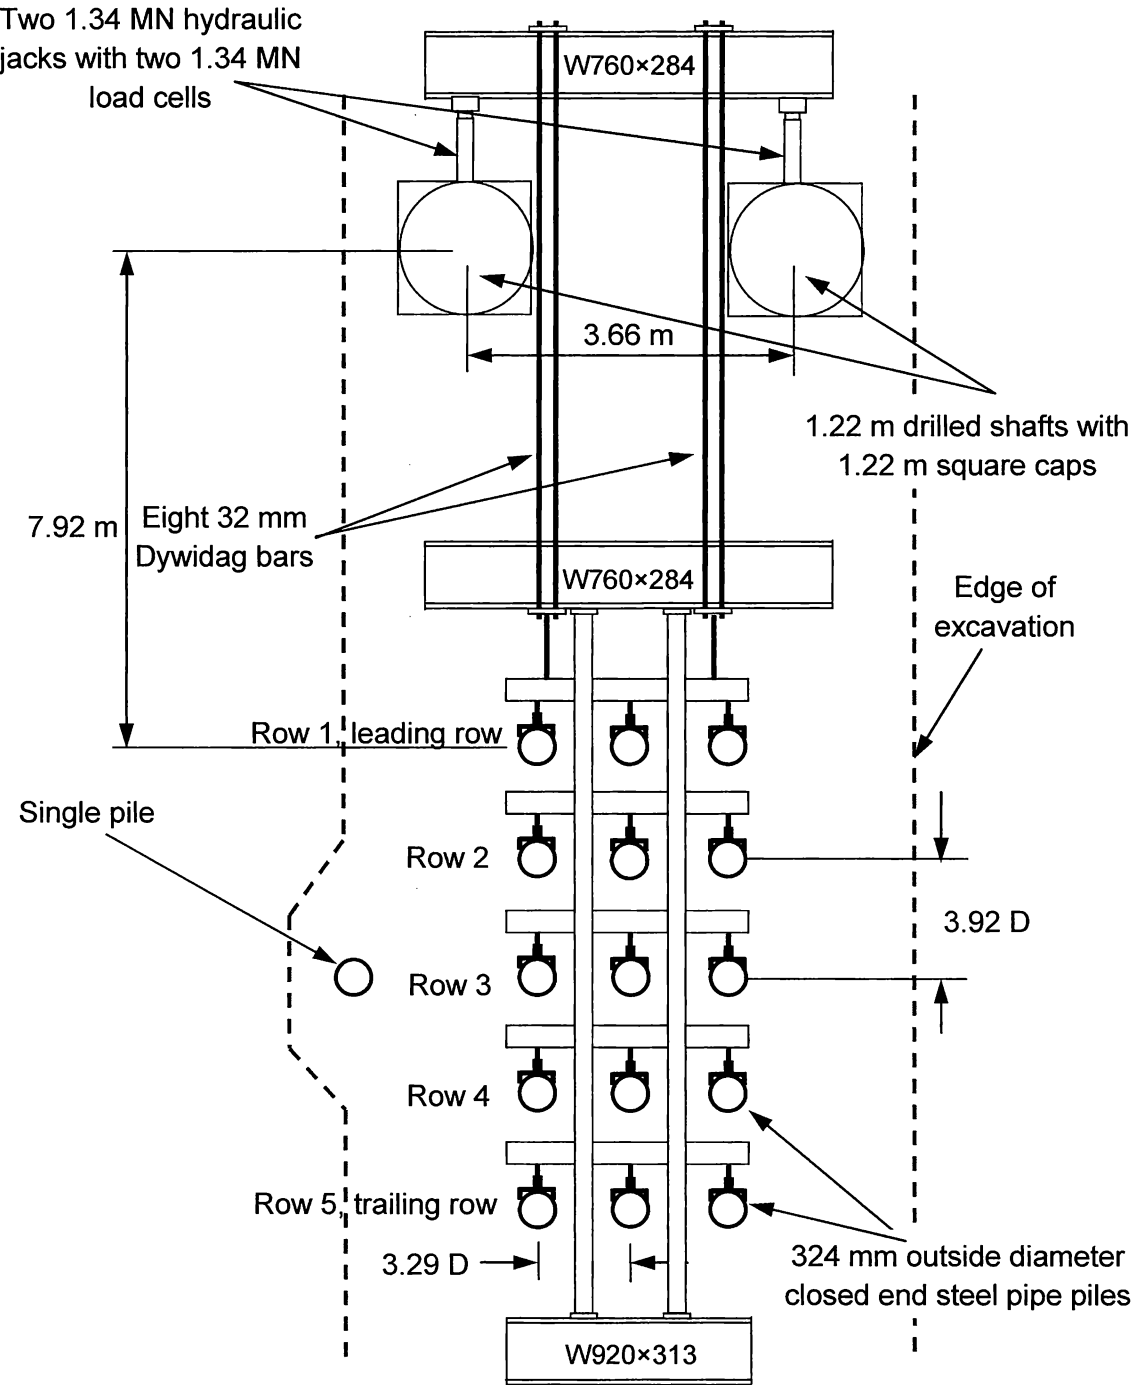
Plan view of loading system for the 15-pile group and drilled shafts: static loading test
